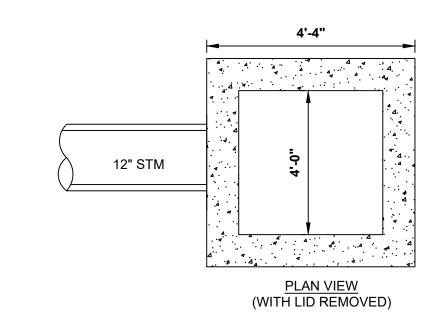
&2 OUTLET CONTROL STRUCTURE. N.T.S.
